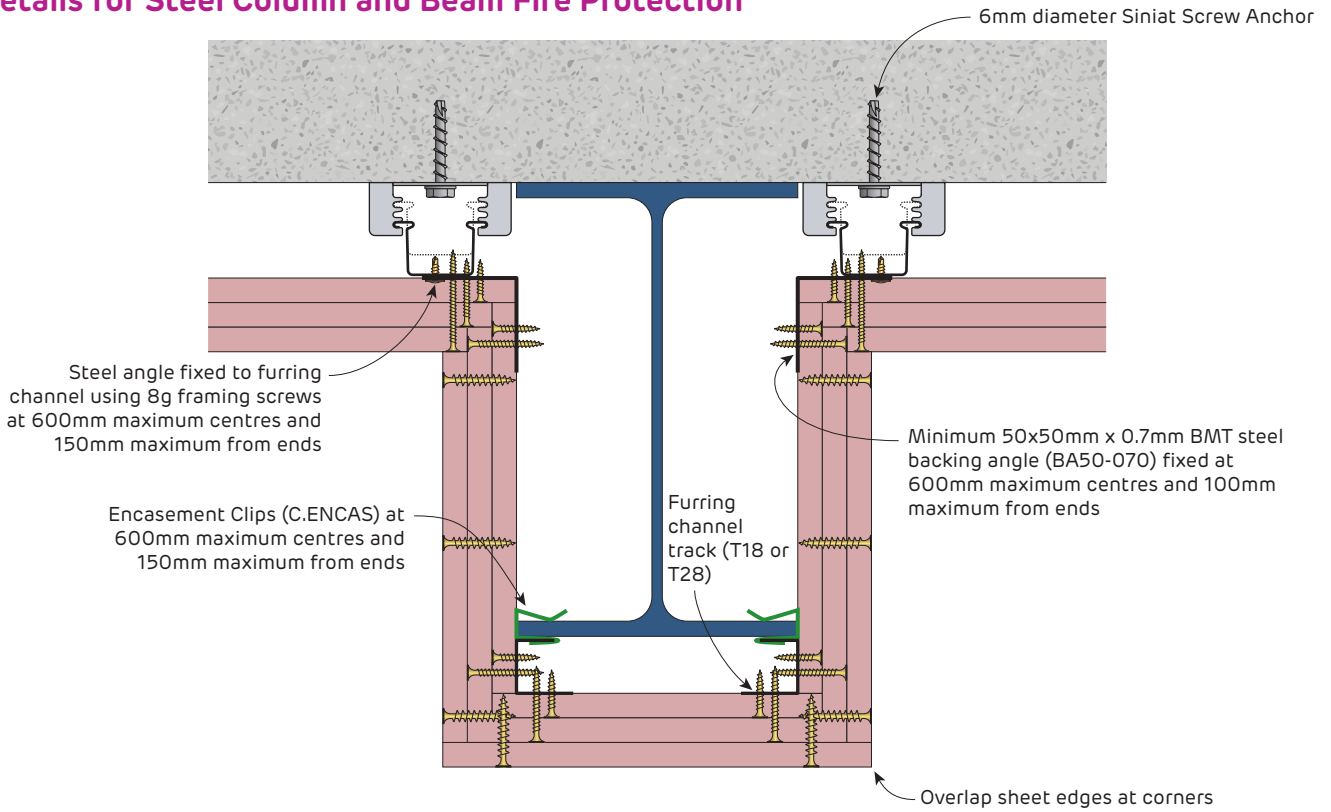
3 Sided Protection for I-Beam to Ceiling Section
